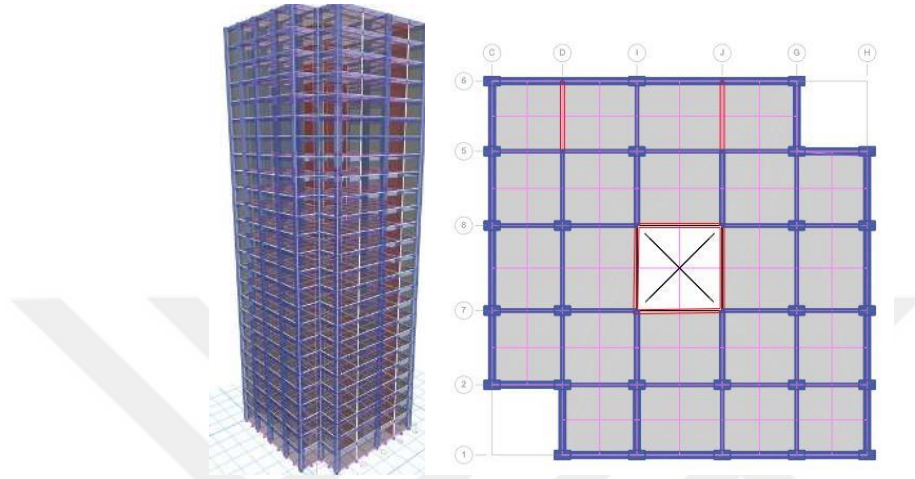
Conventional Floor Model Isometric & Plan View (6.3-5.5-5.2).
